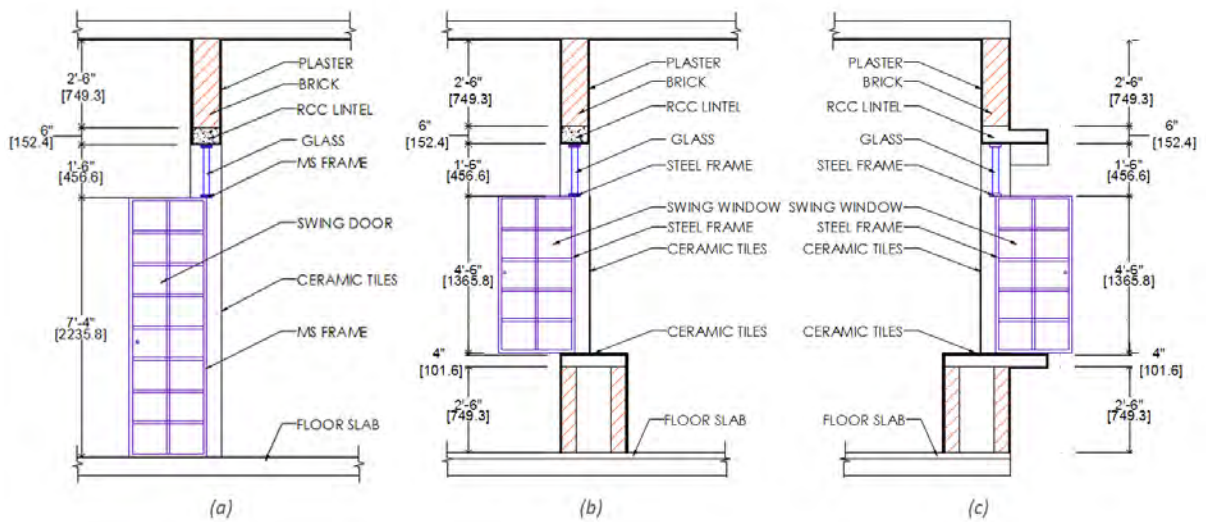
Inpatient room of Surgery envelope section. (a) Door section on corridor side (b) window section on corridor side (c) window section on exterior wall.
